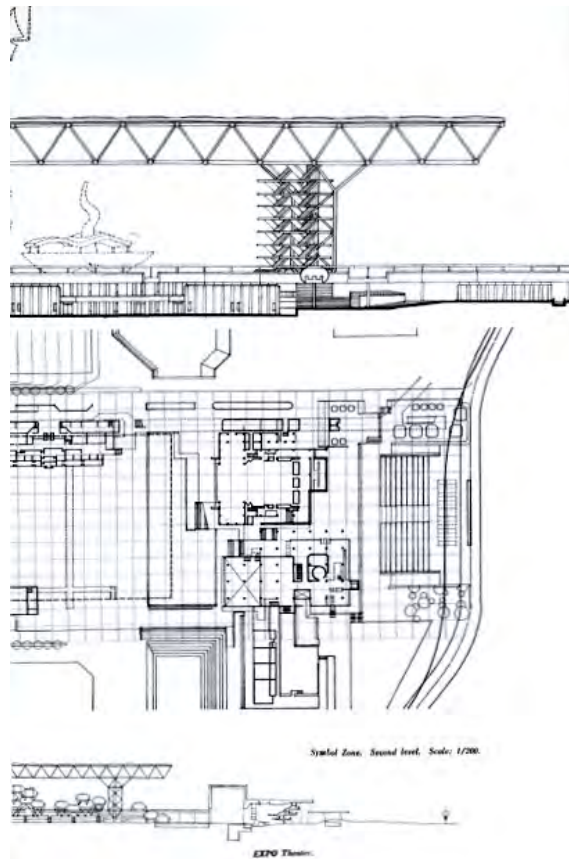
The Space Frame Roof and Festival Plaza, Osaka Expo '70, plans, (in: *The Japan Architect. International Edition of Shinkenchiku*, no. 151, (April, 1969), pp.34-35)
